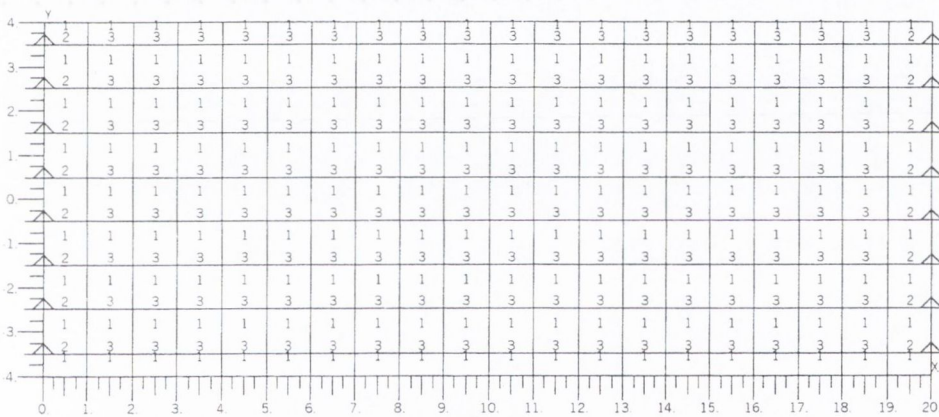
Beam and Slab Bridge Finite Element Model
